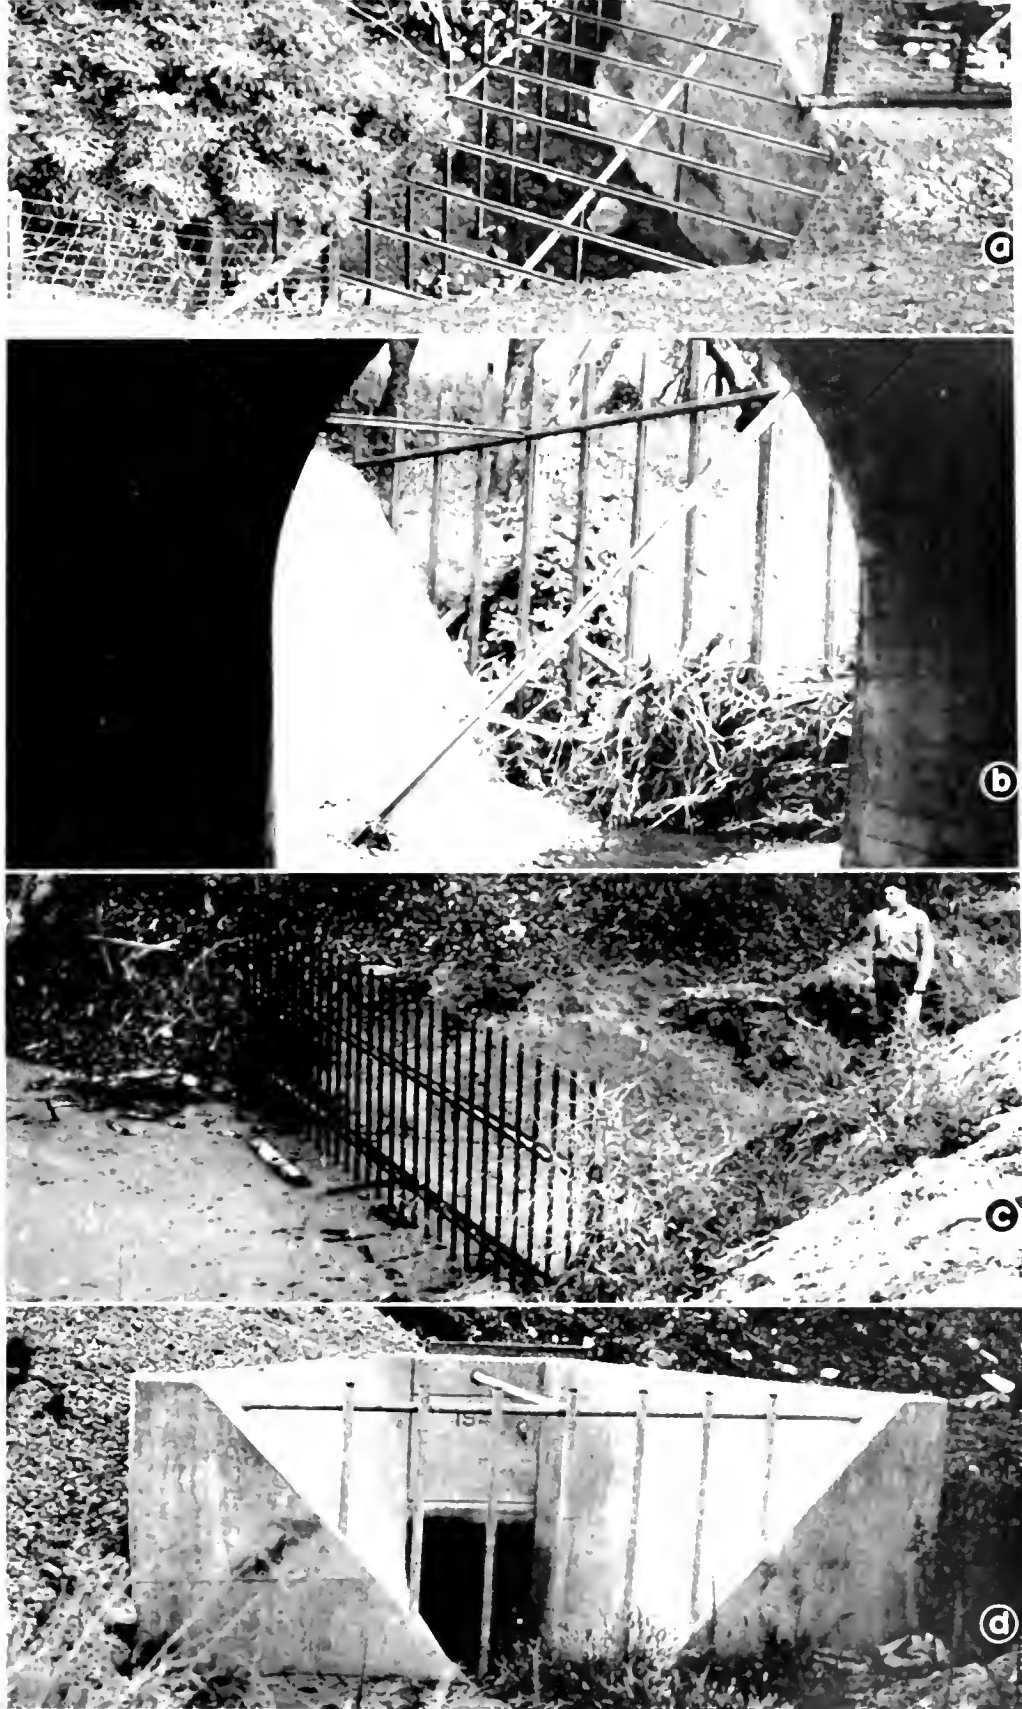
(a) Steel rail debris rack installed at end of wing walls to large reinforced concrete arch culvert. (b) Steel rail debris rack at end of wing walls to reinforced concrete arch culvert. (c) Steel rail debris rack placed in channel well above a culvert entrance. (d) Pipe debris rack at end of wing walls to reinforced concrete culvert. Note warped wing walls and curved-lip entrance.
